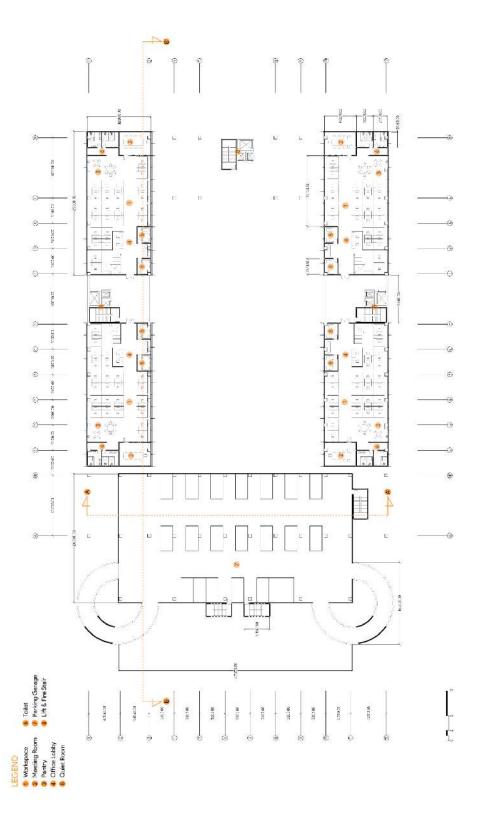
2nd Floor Plan (Source: Personal Illustration)
